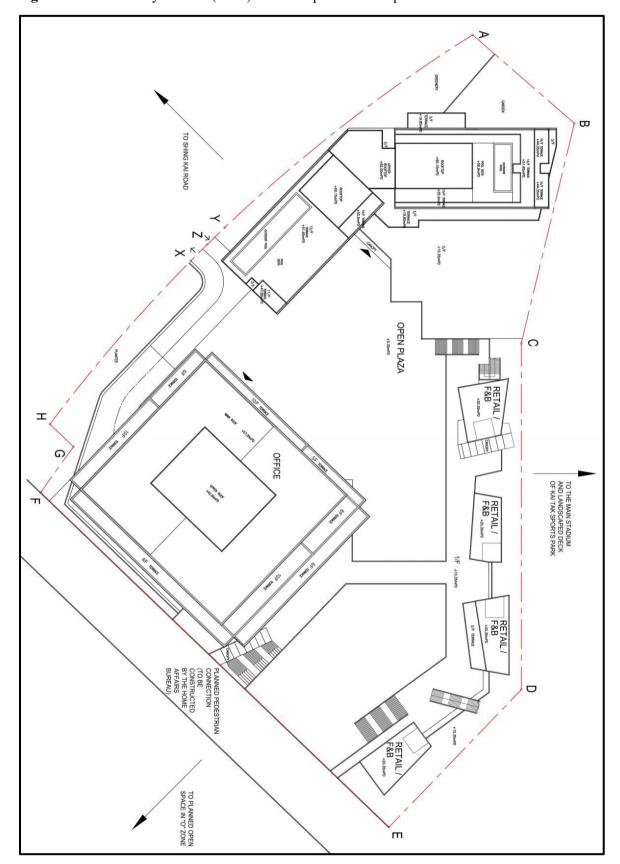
Master Layout Plan (MLP) of the Proposed Development
